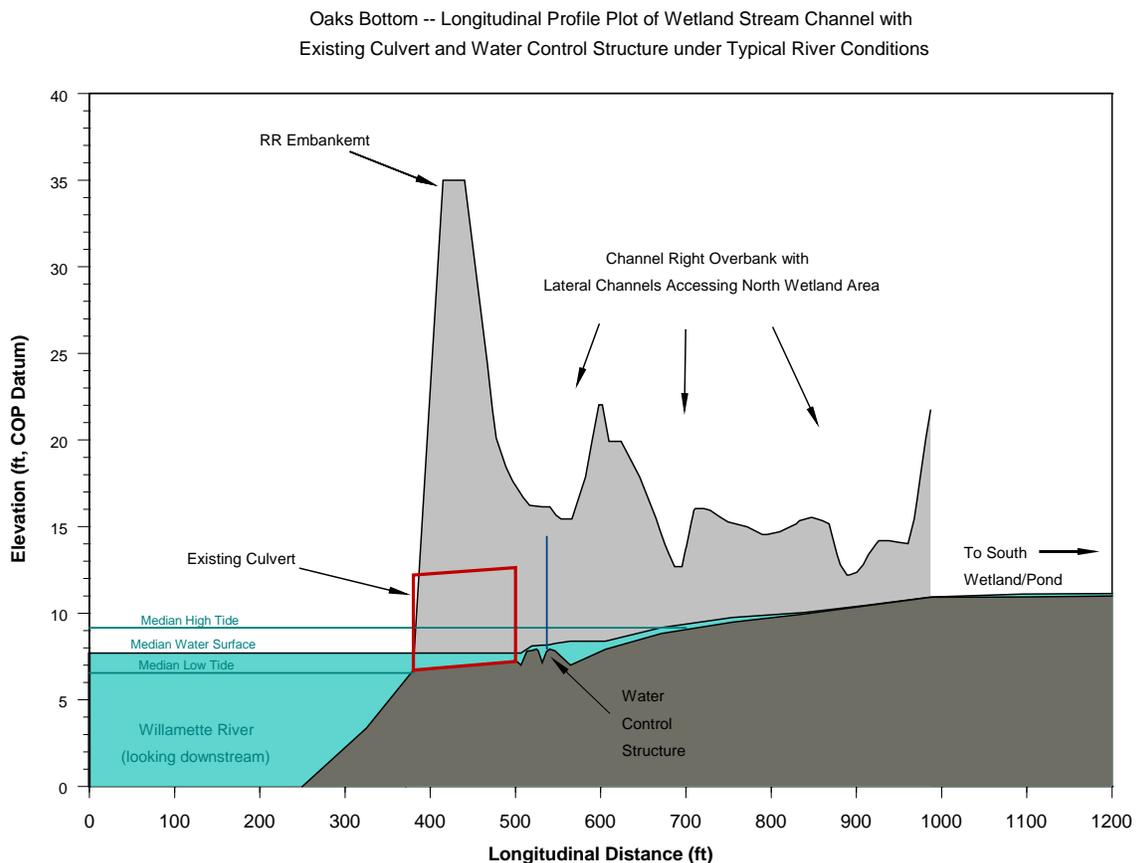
Longitudinal Profile of the Primary Wetland Channel Including Water Control Structure and Culvert.
